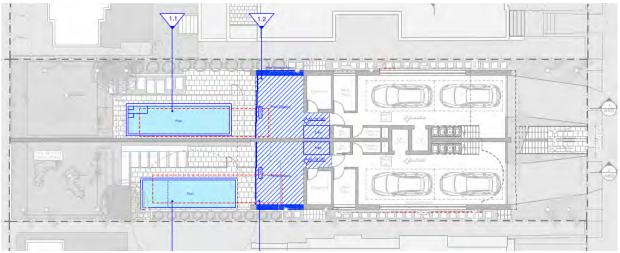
Lower ground floor plan of No.15A and B Lord Howe Street
